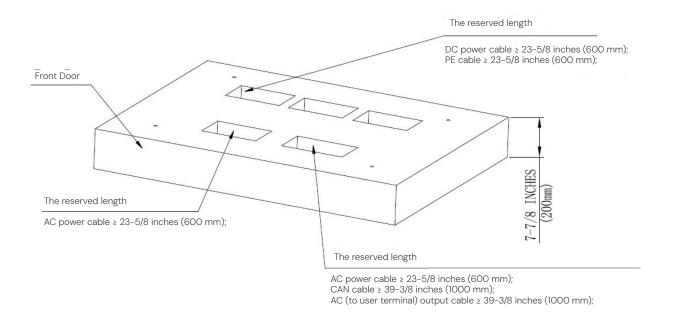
C Hole positions and dimensions of the Power Bank concrete foundation
